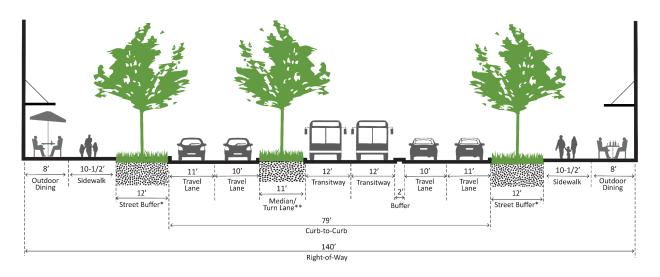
Georgia Avenue (M-8): Spring Street to Colesville Road, Looking North
